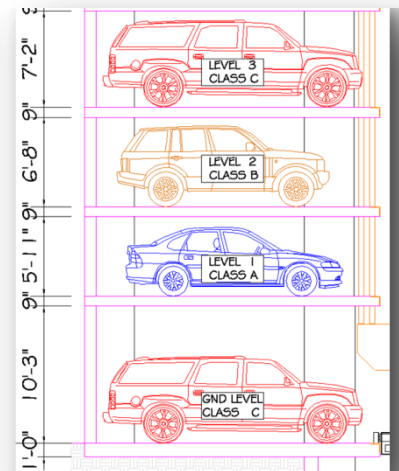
Vertical Layout courtesy of Parking Development Solutions, LLC and Davis
